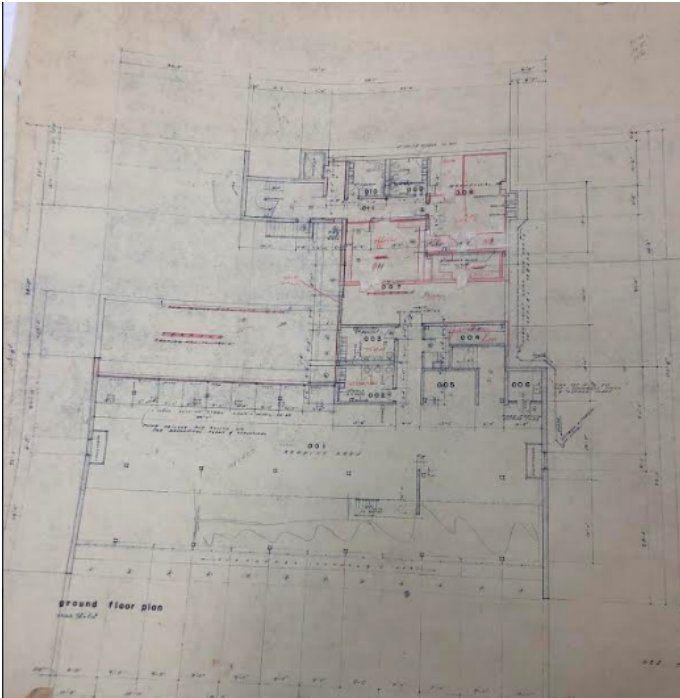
An architectural record from 1950 outlines the original plans for the Storch basement (Office of University Architect 1950).
